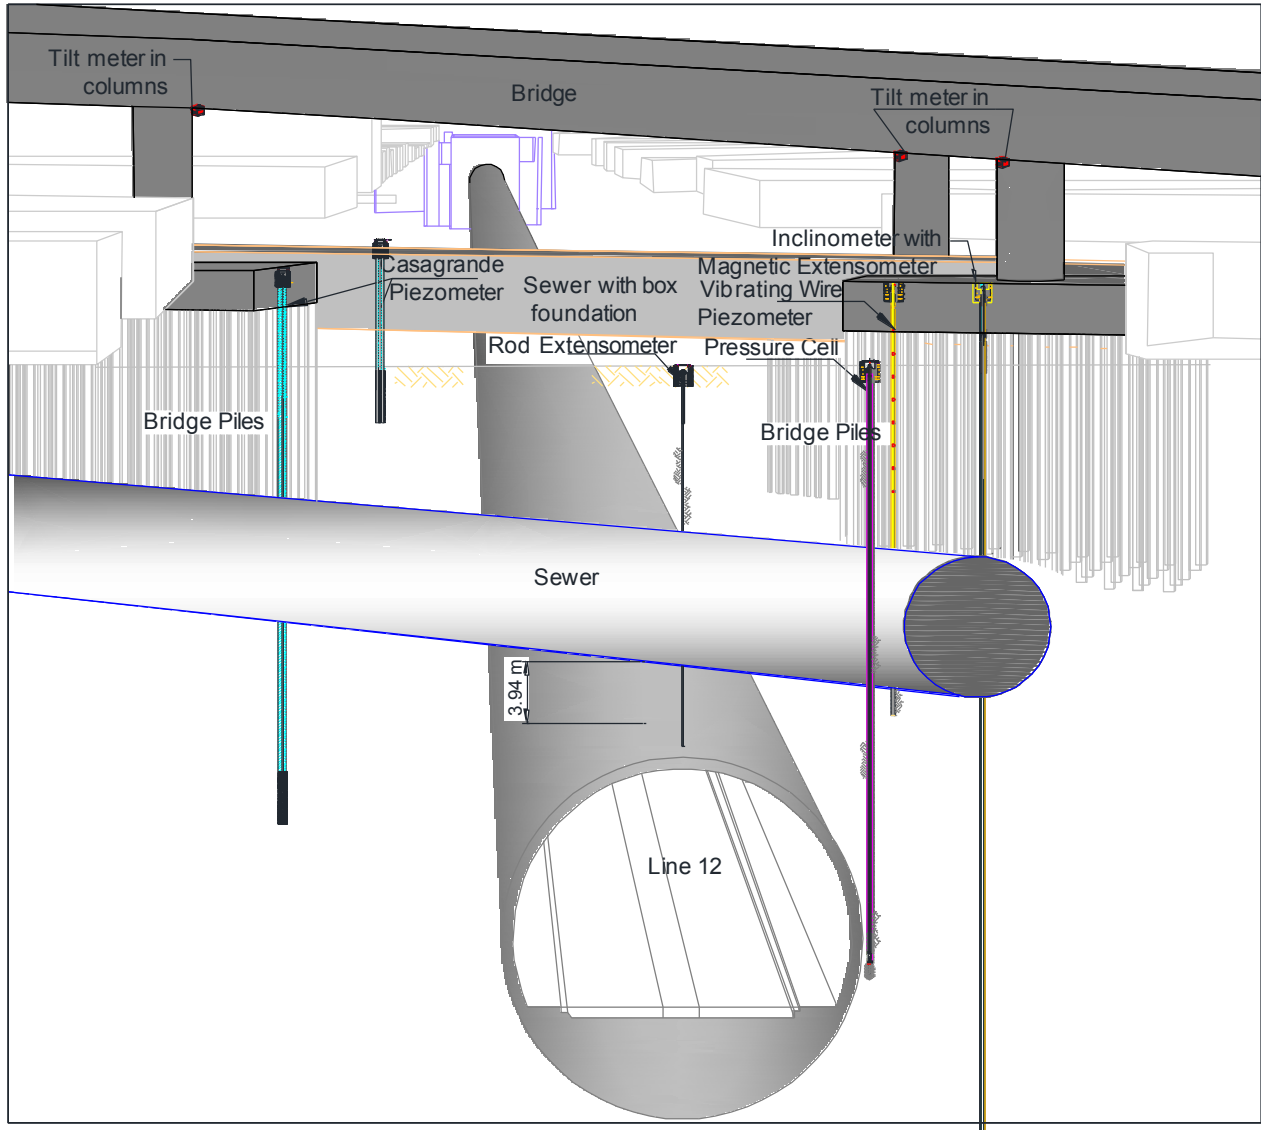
Instrumentation system of the tunnel junction with sewers and a bridge foundation
